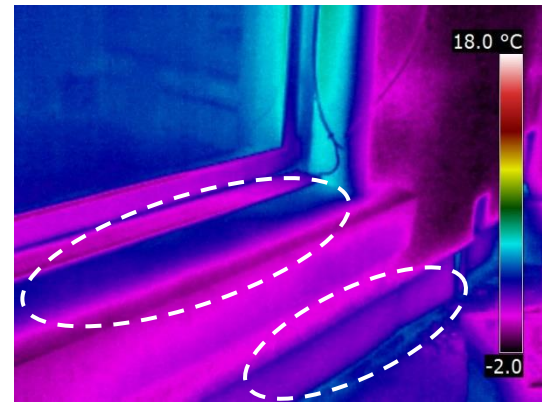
Case study A Post-retrofit thermogram of bottom of first floor window and top of ground floor window
